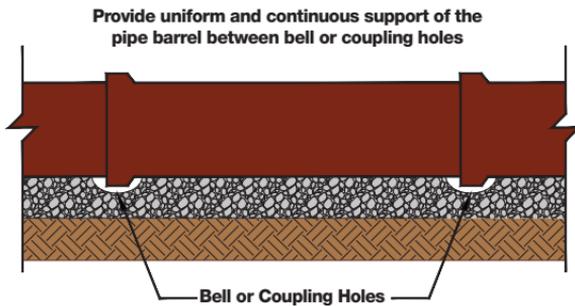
Clay bell or couplings should support no part of the trench backfill load
